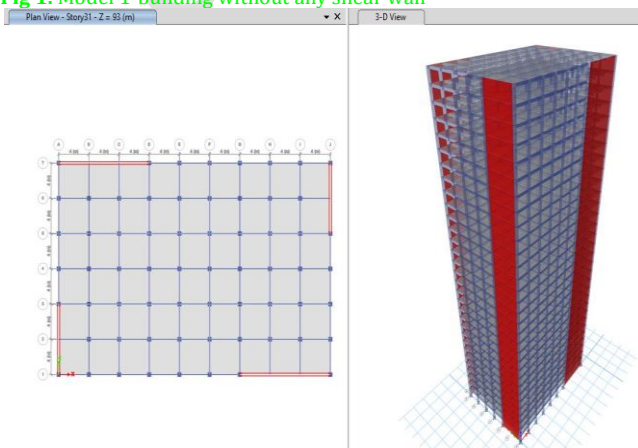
Model 3- Buildings with shear walls located at all four corners-2
